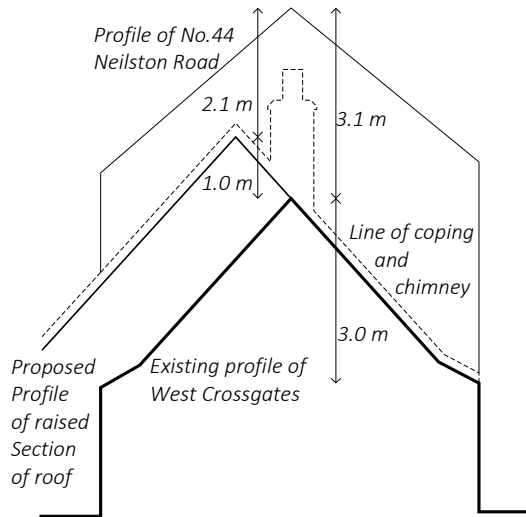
Roof profiles of West Crossgates, proposed extension and No.44 Neilston Road
